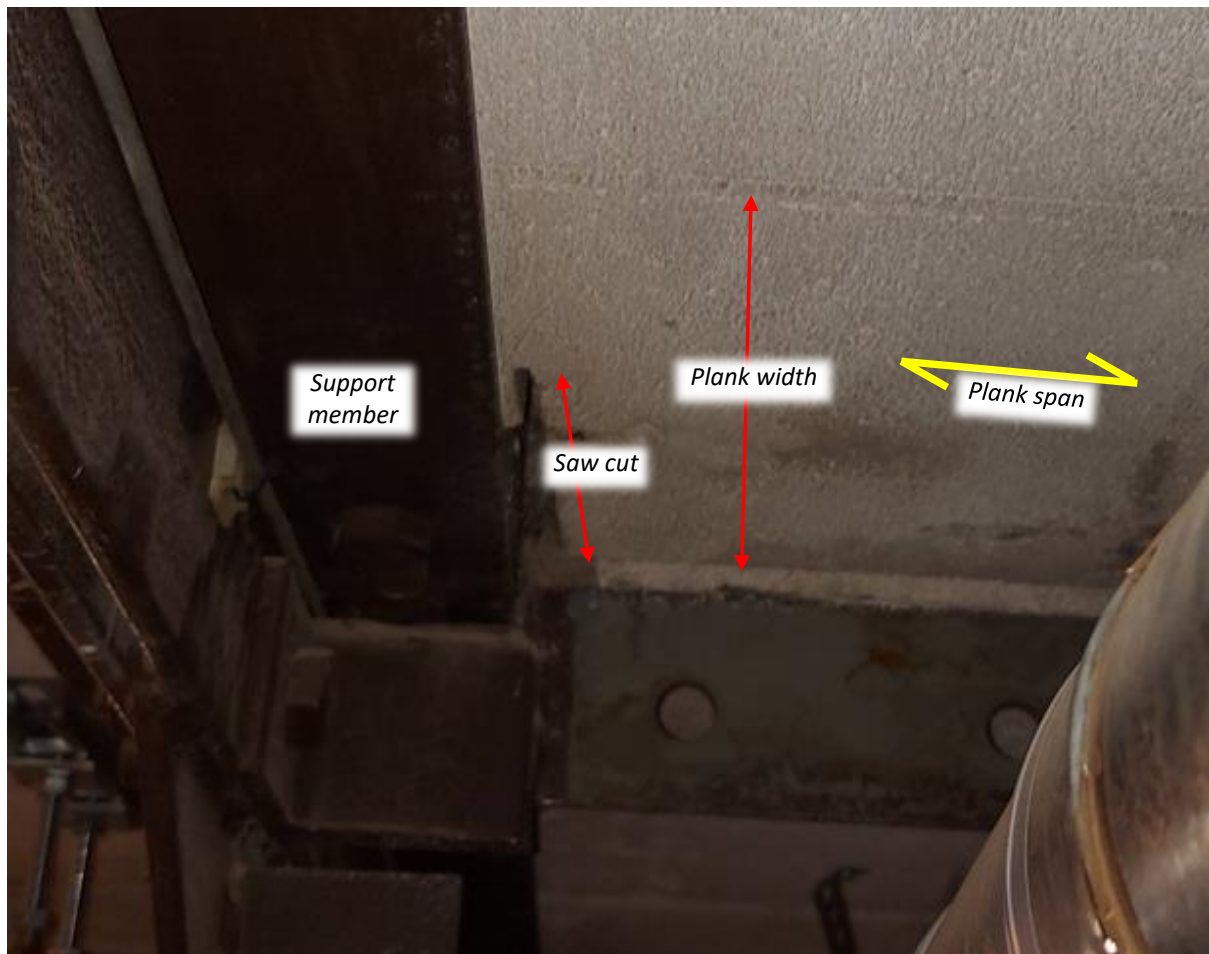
RAAC PANEL CUT AT SUPPORT LOCATION
